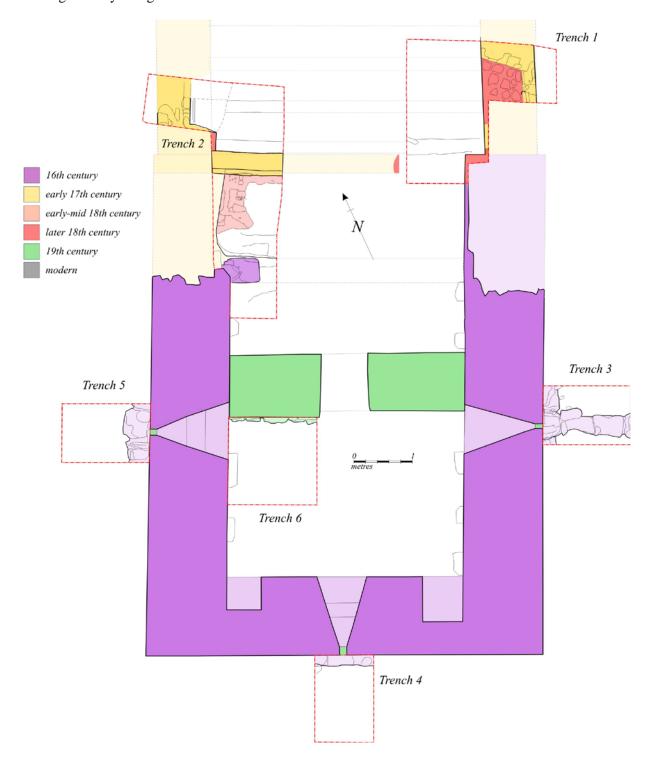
Plan of the tower showing excavated remains, phasing, etc
